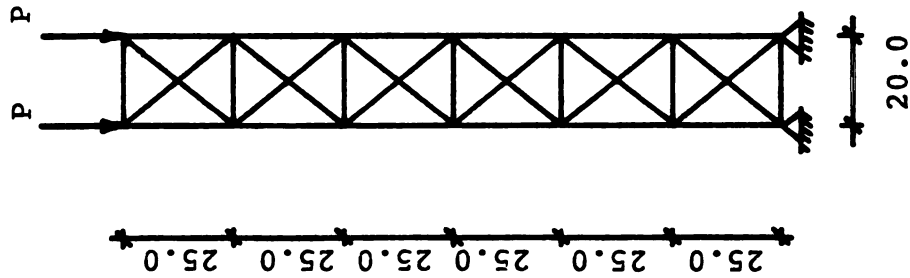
Properties of Truss and Truss-Beam Towers.
